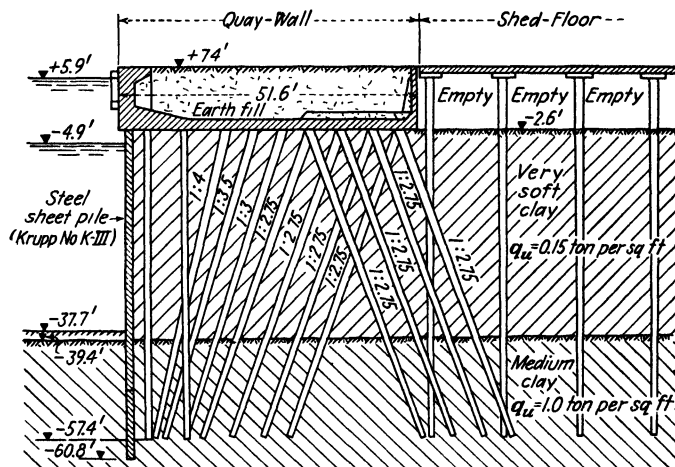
Section of quay wall and shed floor at Bangkok, Siam. (After J. Brinch Hansen, Refs. 166 and 167, 1946.)
